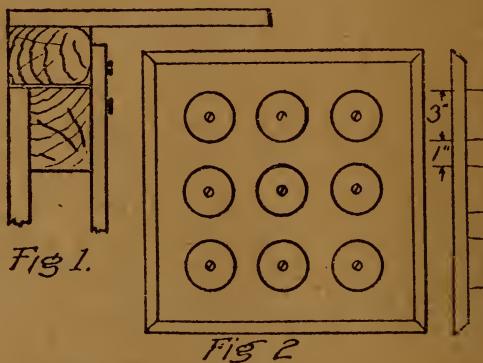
CORNER DETAIL OF MANHOLE FORMS
